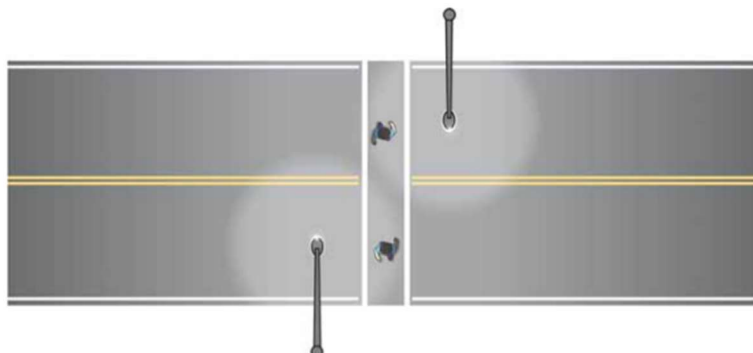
Drawing. New design for midblock crosswalk lighting layout.
